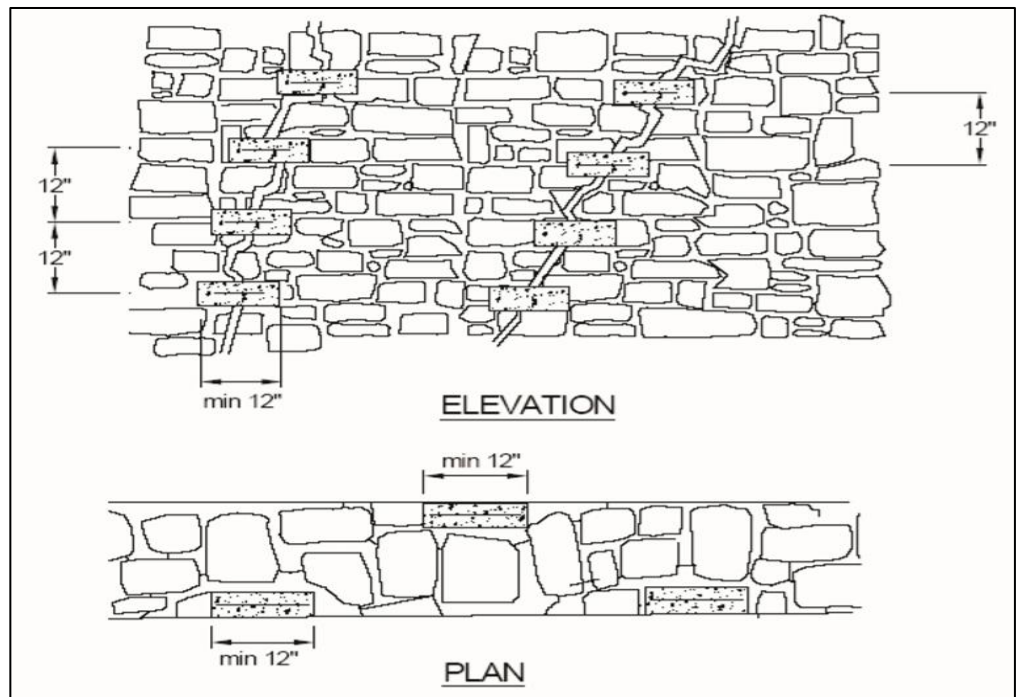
Repair of inclined cracks in masonry walls
